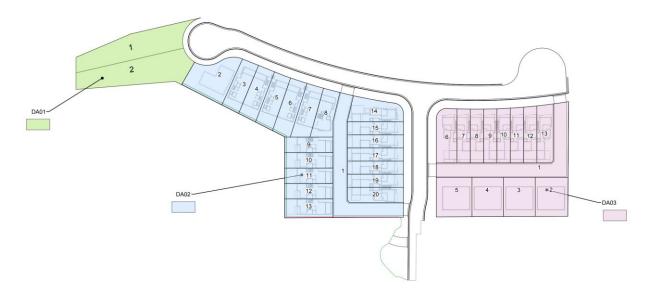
Approved staging plan for DA2021/0053 – site identified as DA01 and in green (Source: Craig & Rhodes)
